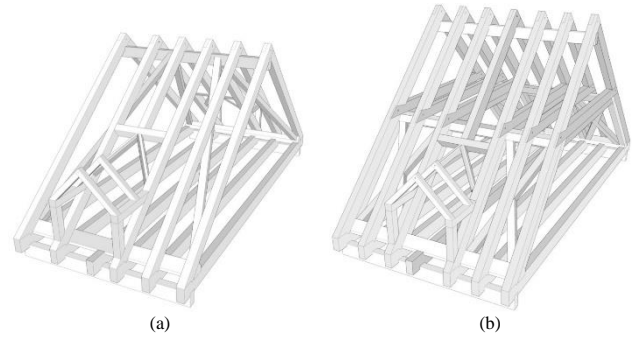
3D renderings of roof trusses: (a) pitches with 35° slope, (b) pitches with 45° slope.
